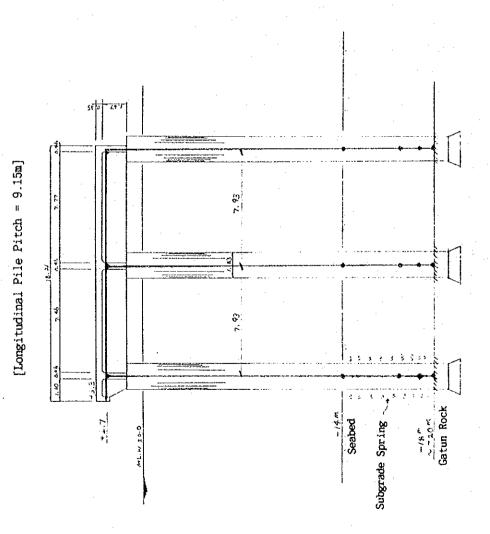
Typical Section and Frame: Pier No. 16
